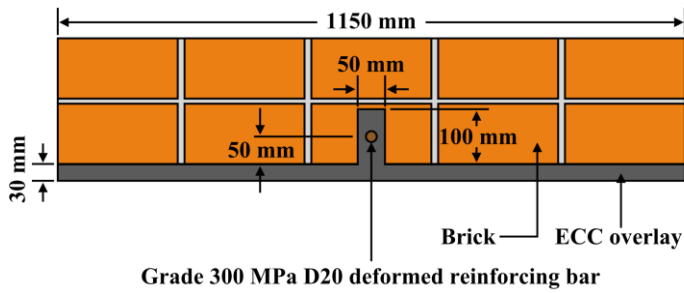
Cross-sectional view of the wall with near surface mounted reinforcing bar configuration (W5-S30-C-NSM)
